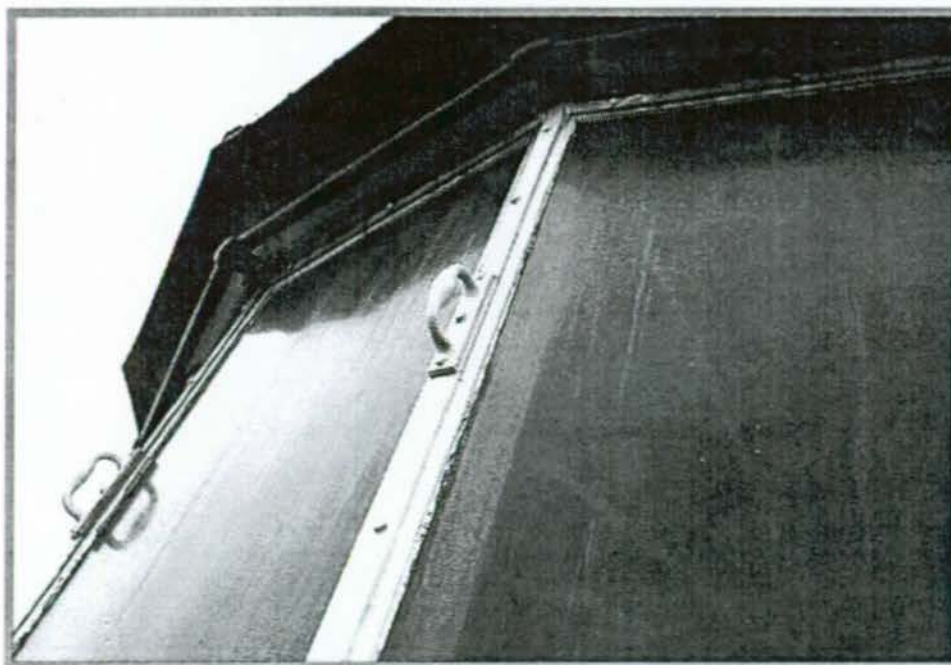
Hairline cracks in cornice above pipe connections, note rust stains on plexiglass sheeting.
